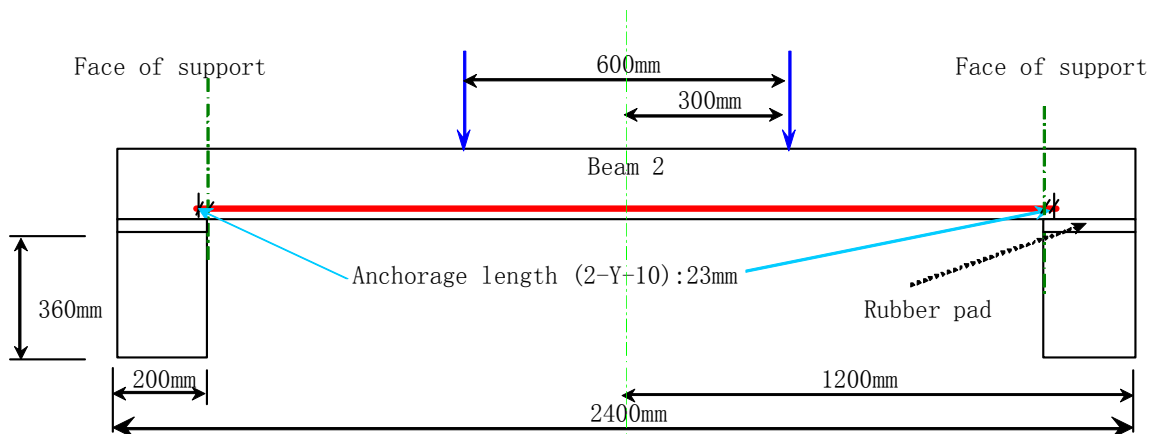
Sketch for end anchorage length of tension reinforcement and support conditions for beam 2.
